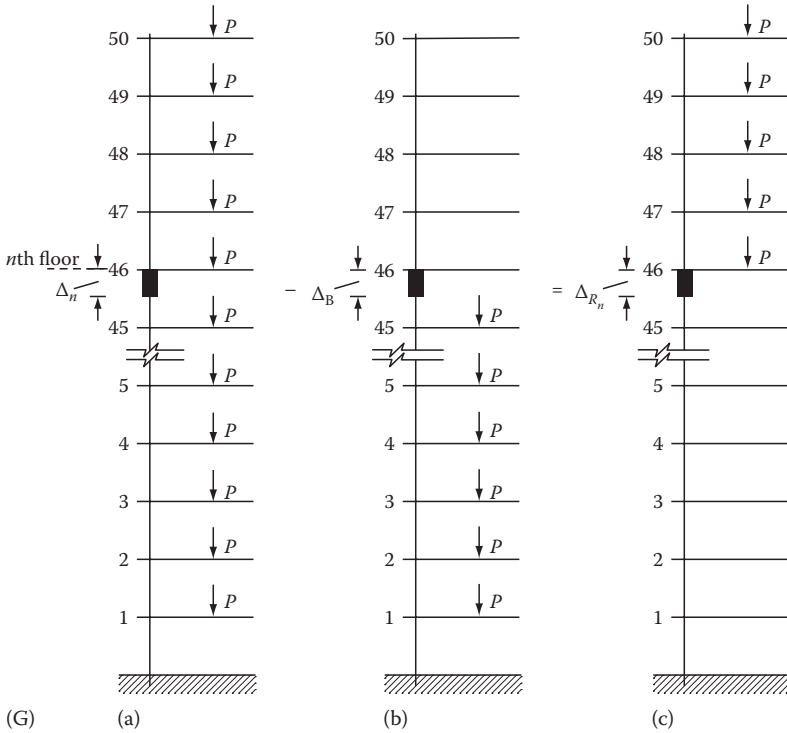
(Continued) (G) Interpretation of column overlength: (a) Δ_n = column shortening at n th level due to loads on the entire height of column; (b) Δ_B = column shortening at n th level due to loads imposed at and below n th level; (c) column shortening yet to occur due to loads above n th level.
